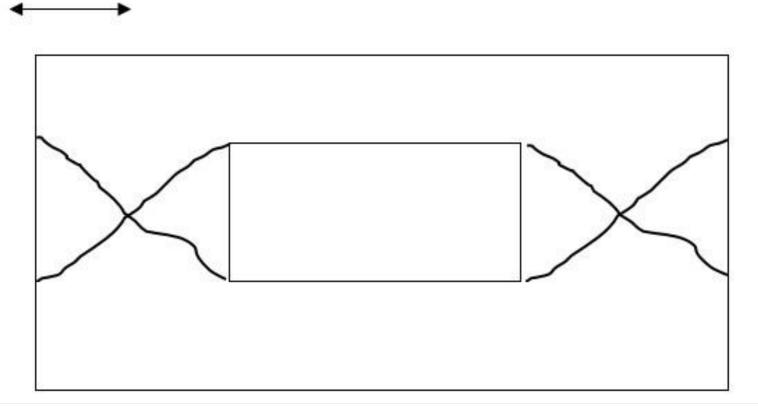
150 or 200 mm Masonry Wall Piers
